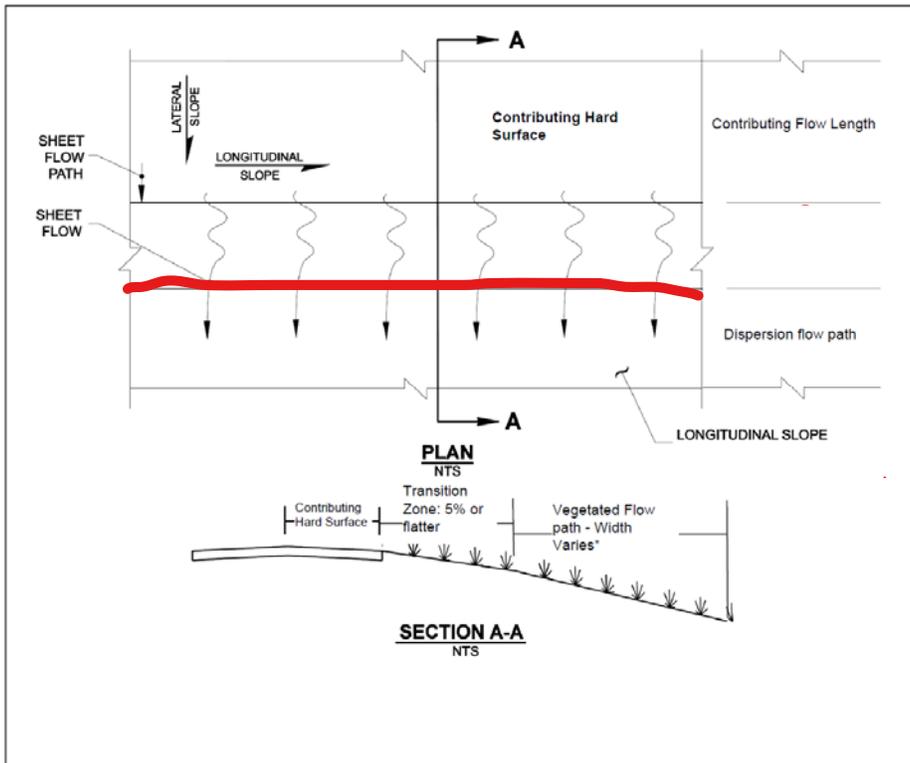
Typical Sidewalk and Trail Compost-Amended Strip for Moderately Sloping Sidewalks or Trails.
